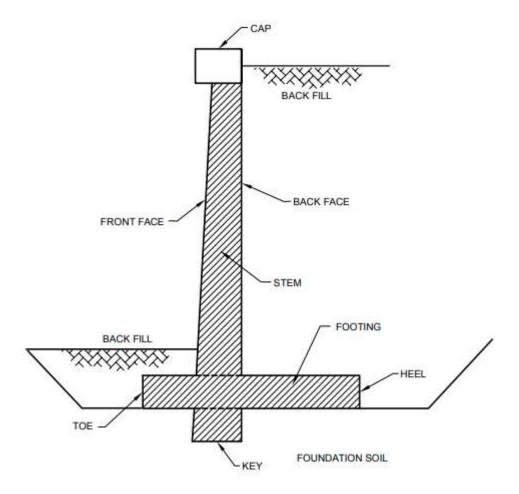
CANTILEVER RETAINING WALL TERMINOLOGY
